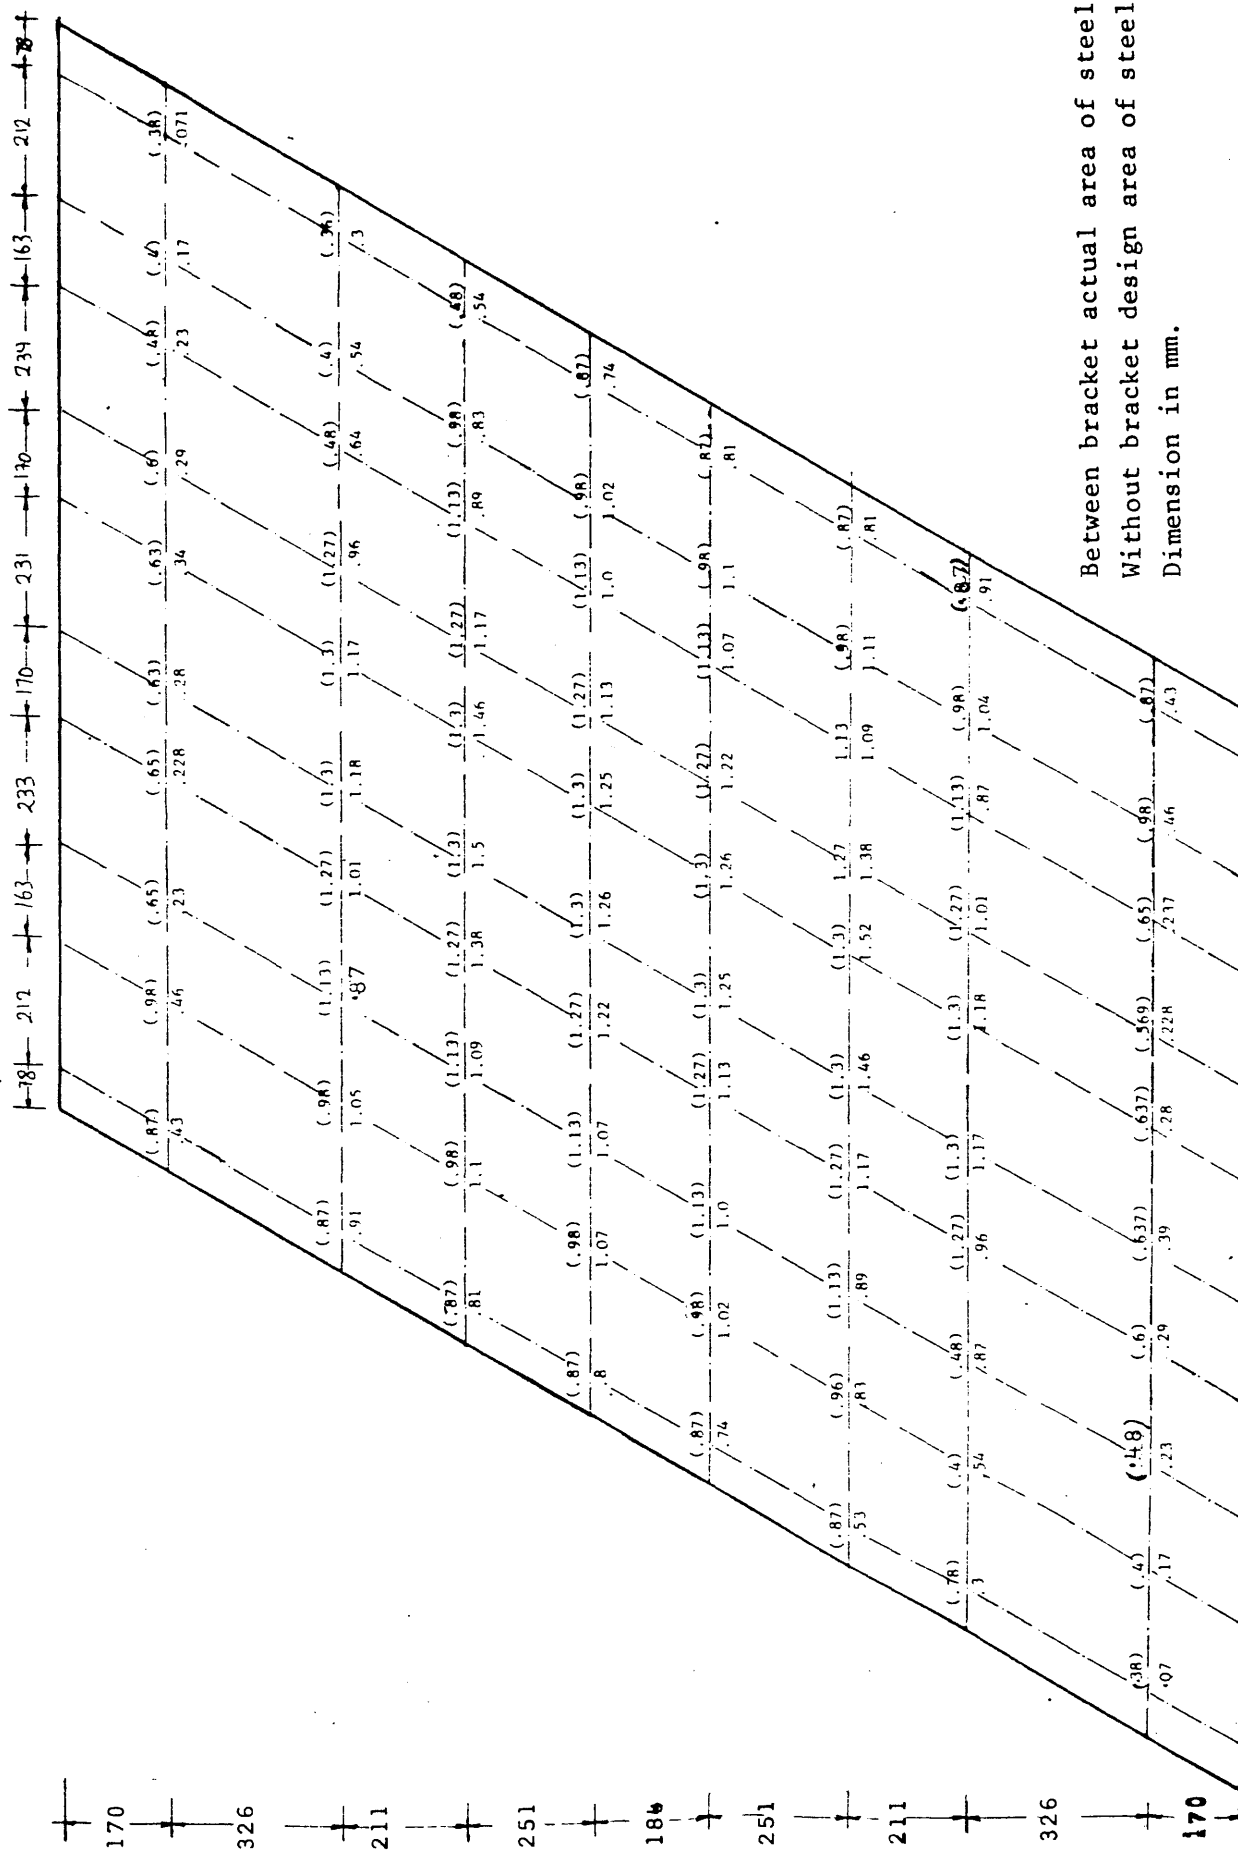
MODEL SKEW SLAB NO.(1) Bottom Longitudinal area of steel per unit width (mm^2/mm)
